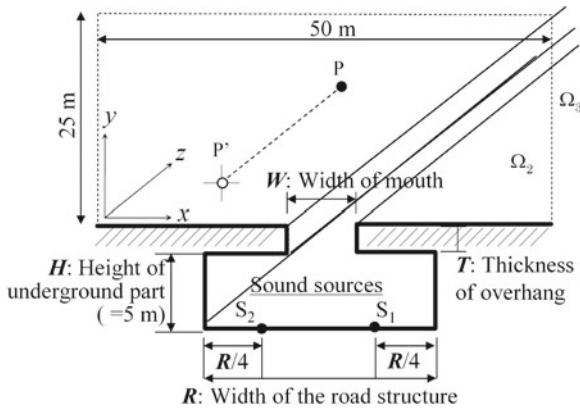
Sectional shape of the semi-underground road structure under investigation
